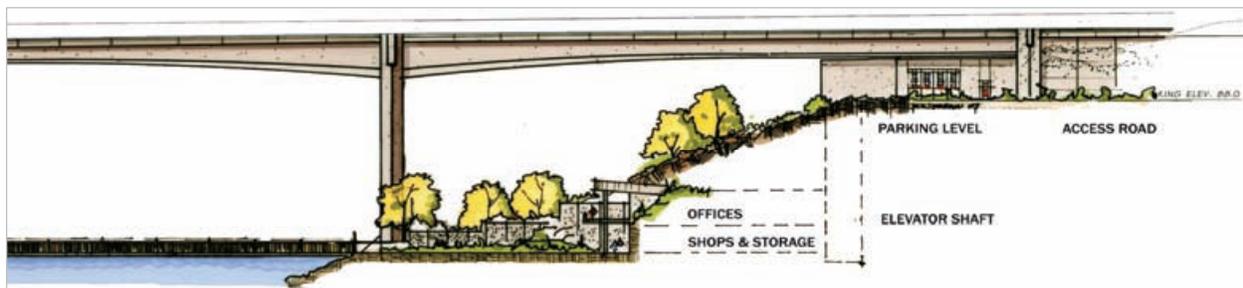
Conceptual Sketch of Bridge Maintenance Facility
